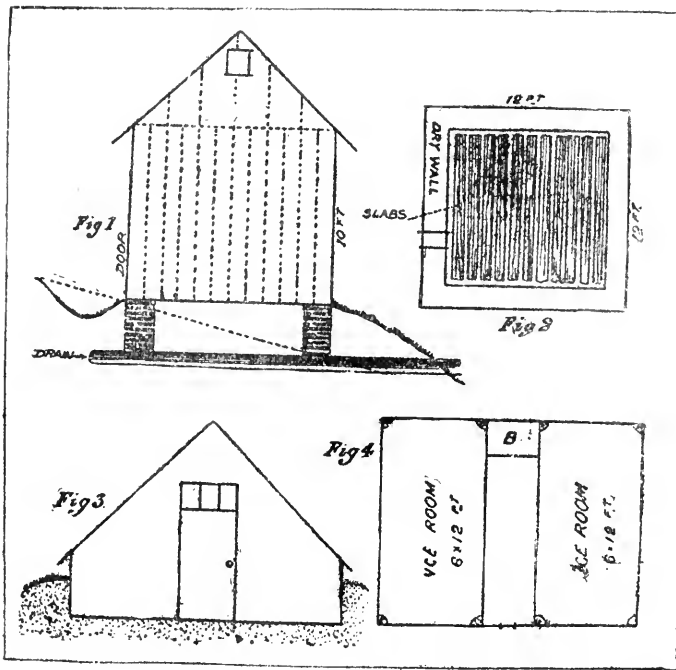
ICE HOUSES. (1) BANK ICE HOUSE; (2) GROUND PLAN; (3) A CHEAP ICE HOUSE; (4) GROUND PLAN OF SAME.
